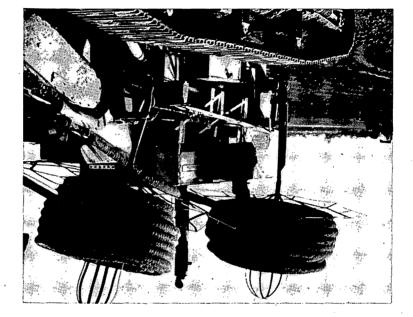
Rolls of corrugated PVC pipes enveloped in coconut-fibre.
